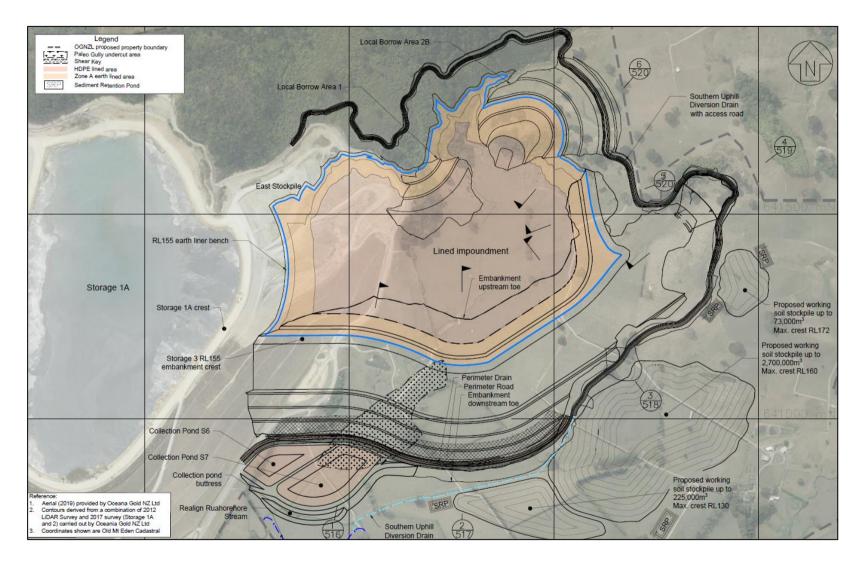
Indicative TSF3 Layout Plan (EGL (2025c))
